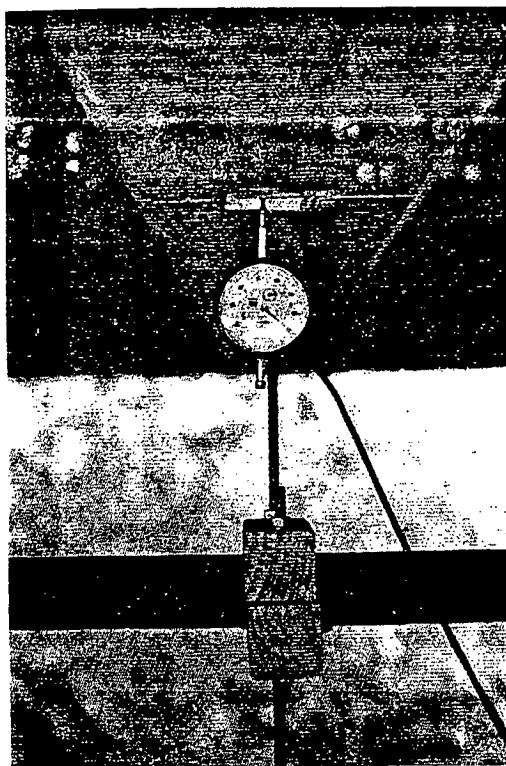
Dial gages positioned to measure vertical deflection of concrete girder
